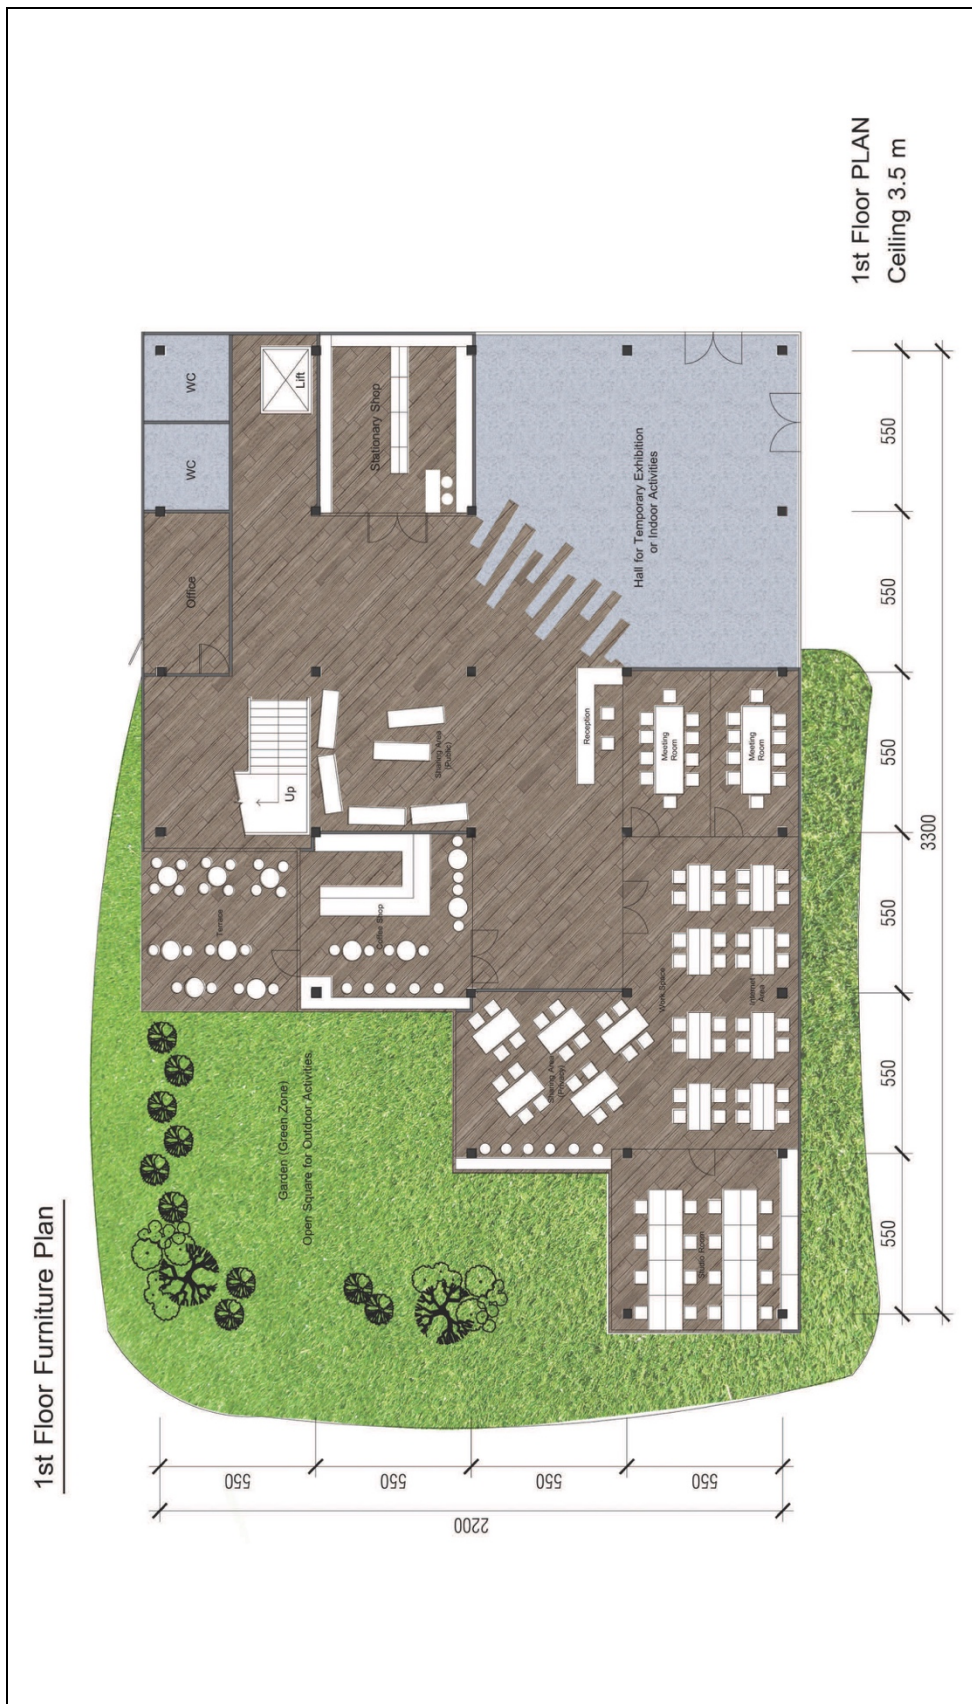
Storytelling to Reflection : Sample of Floor plan and zoning
